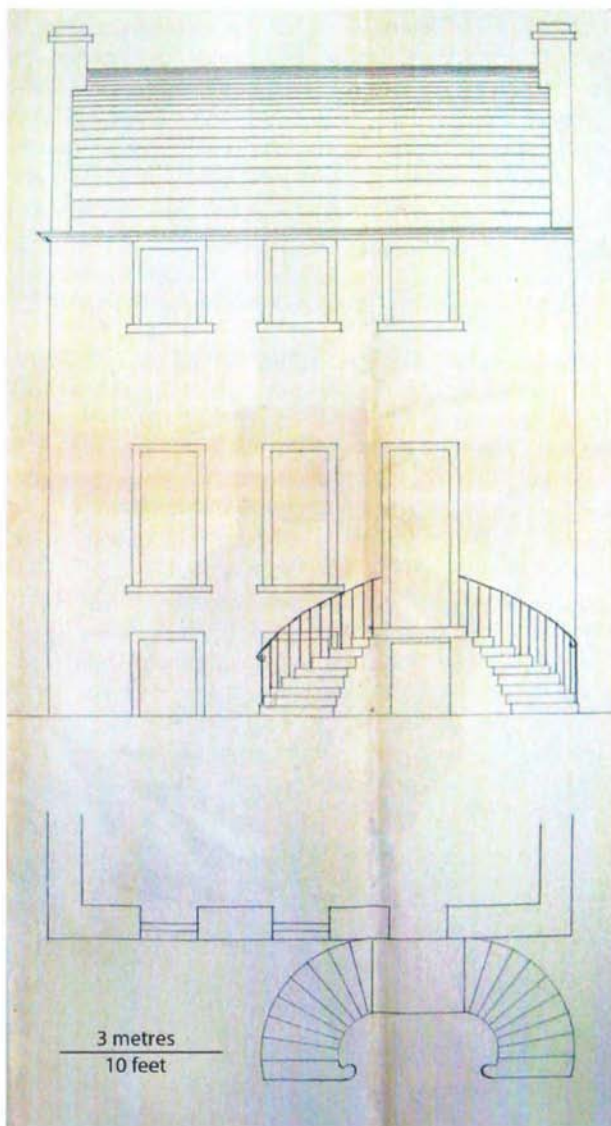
(a) Front Elevation and (b) plan of the Building at 10 Surgeons' Square bought by Dr Barclay and used by him from 1802-1815.
